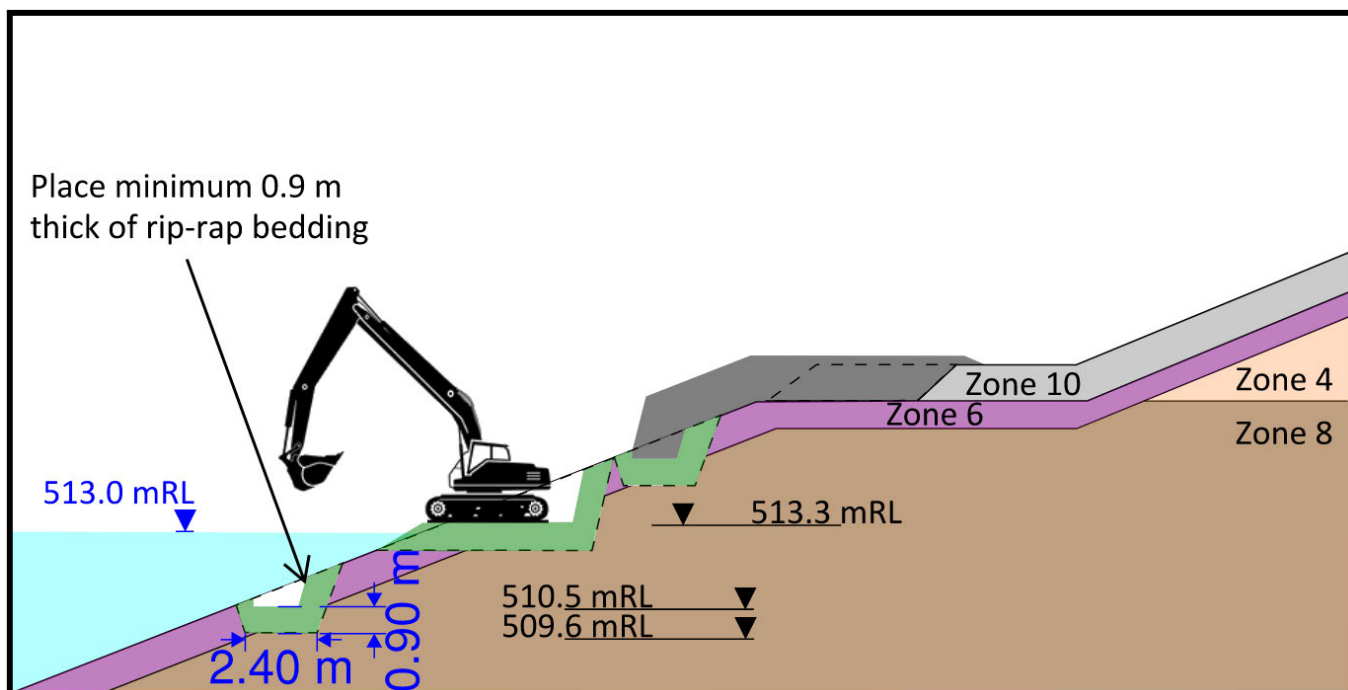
Schematic sketch – Tranche 2 – Main Dam – construction of key toe and installation of rip-rap bedding
